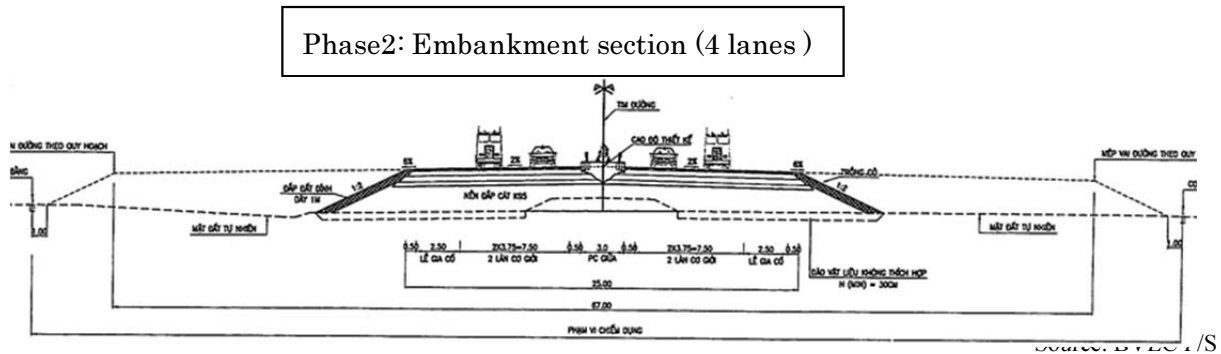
Typical Cross Section for Embankment section for Phase 2 for Vung Tau intersection (Km66+000) – NH51 intersection (Km68+653.42)
